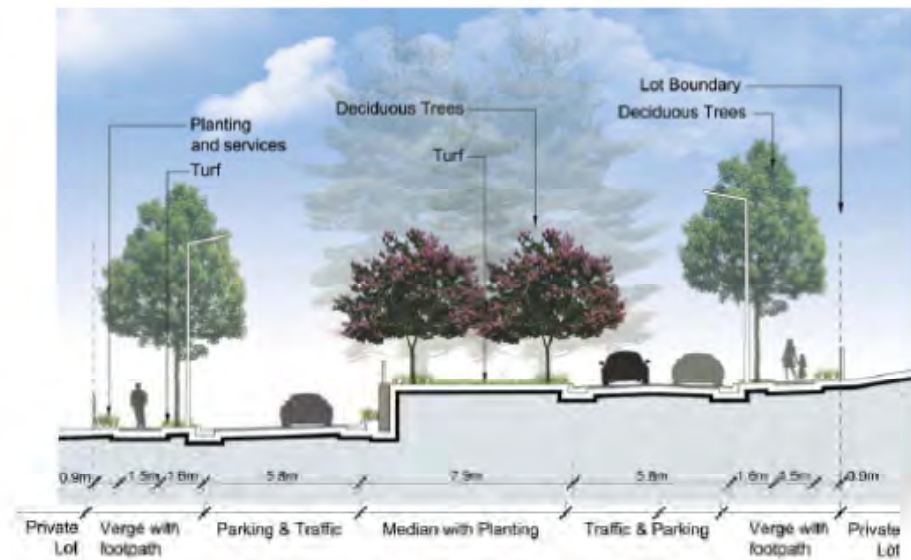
Mountain View Crescent West Cross Section (Source: Place Design Group)
